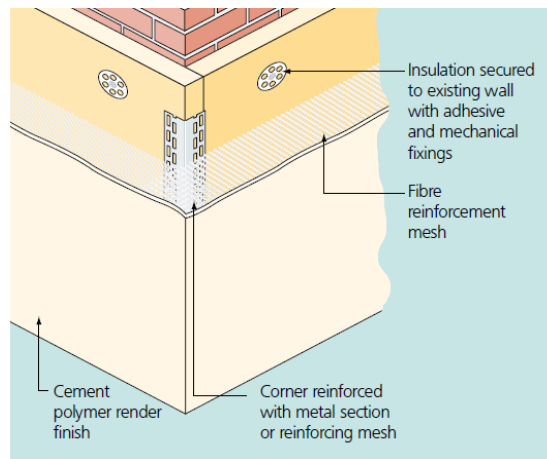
Example of external wall insulation for a masonry wall. Extracted from [46]
